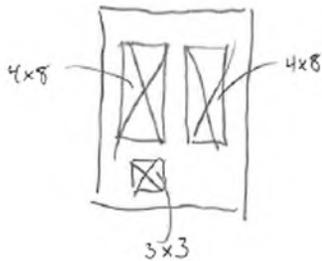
Reservoir EXTERIOR WALL Elevation– Note location of ladders and other features.
